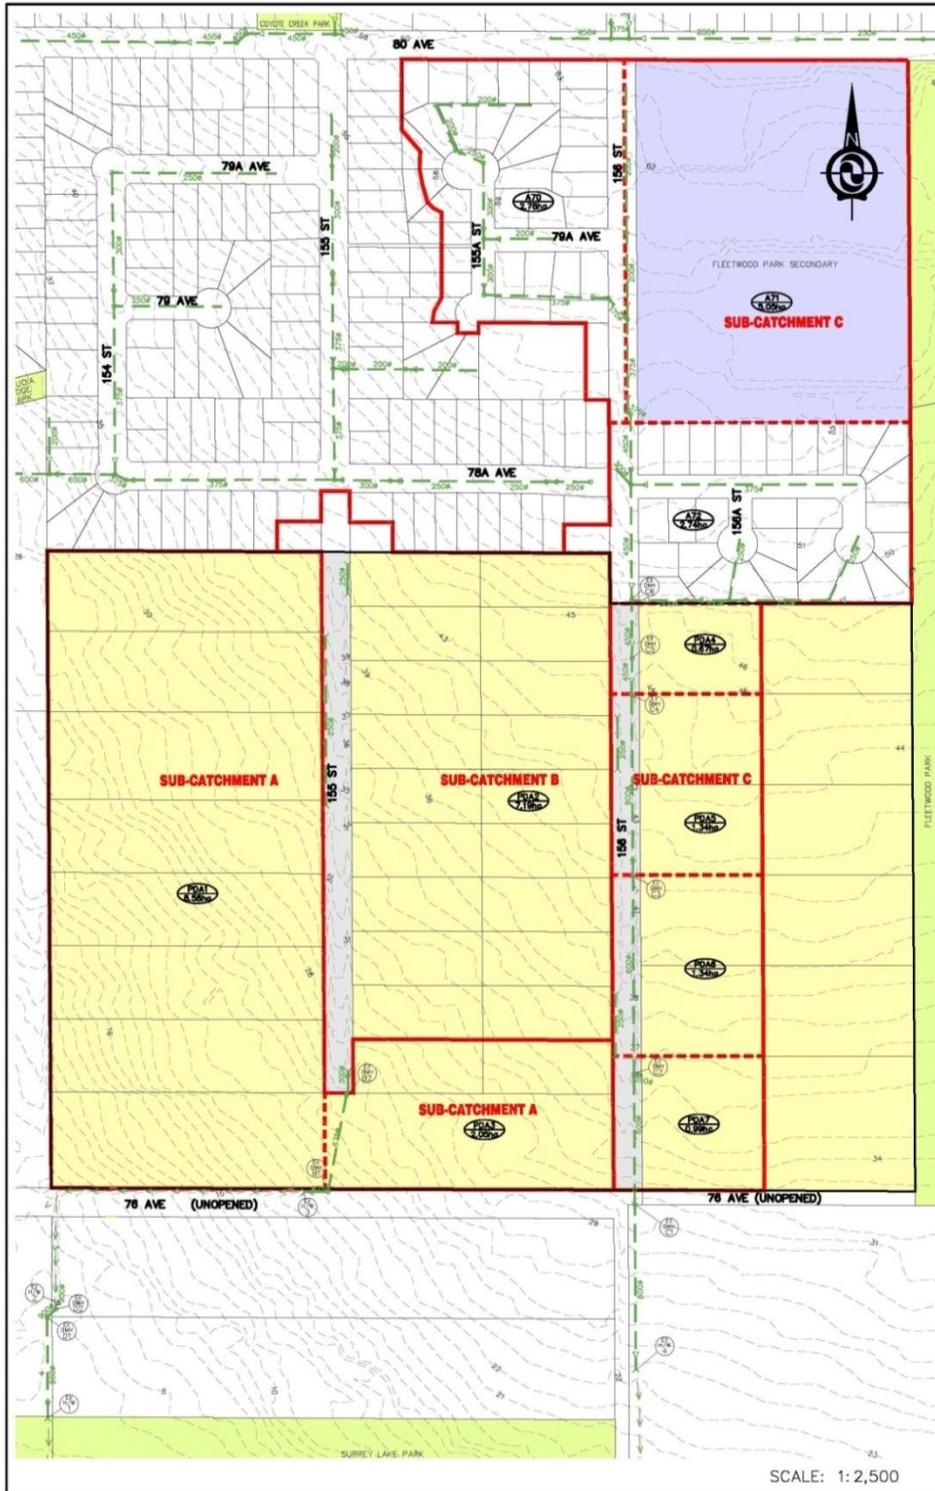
Existing Stormwater Sub-Catchments and Infrastructure
